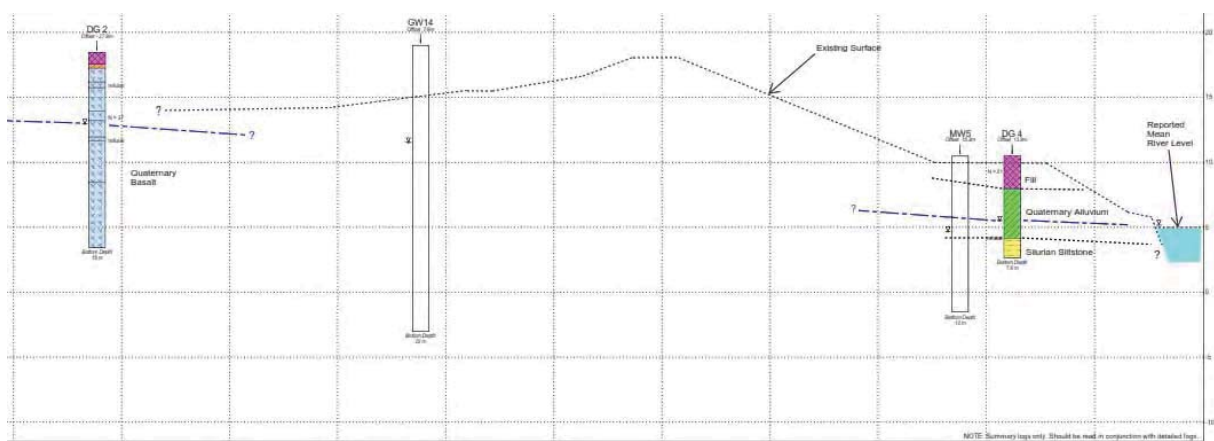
Cross Section A2 Extract (see Appendix B for full cross section drawing)
